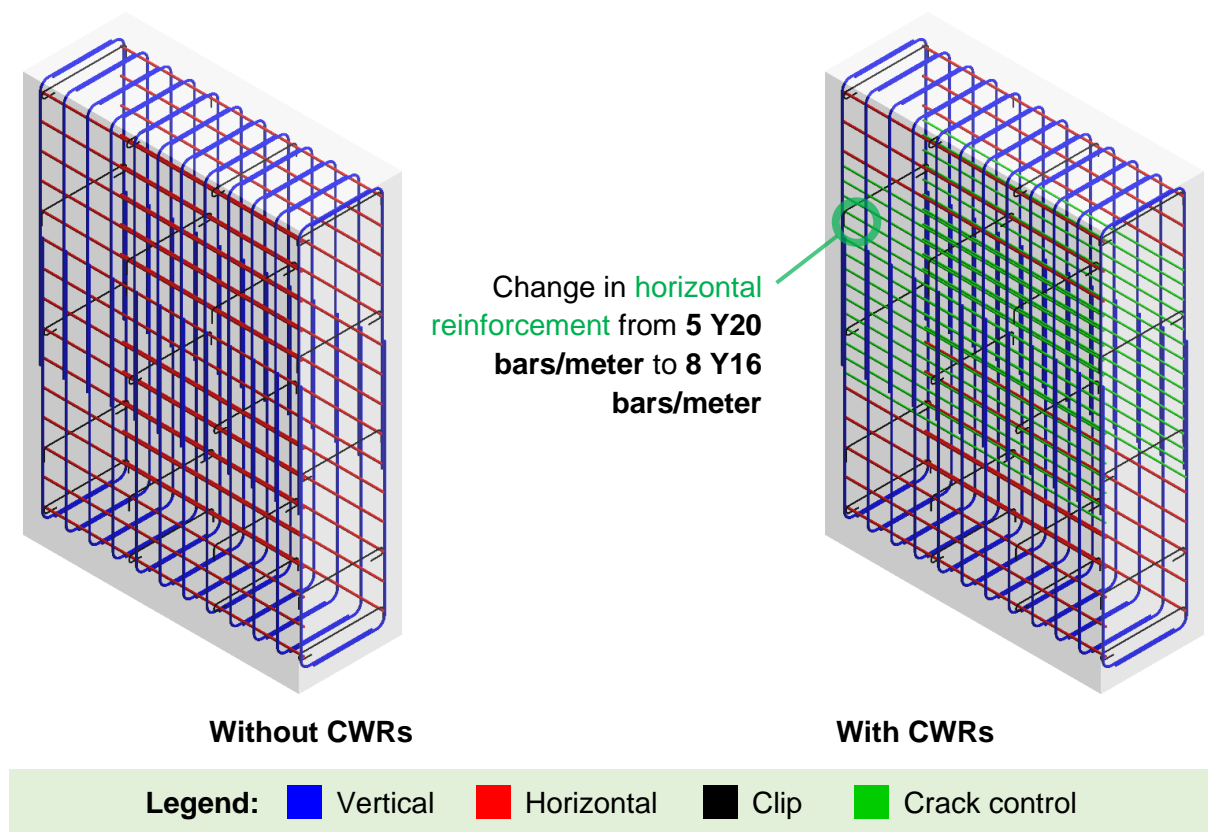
A summary of the design of the F01 wall units, showing 3-D views of the wall units designed with and without the crack width requirements (“CWRs”).
